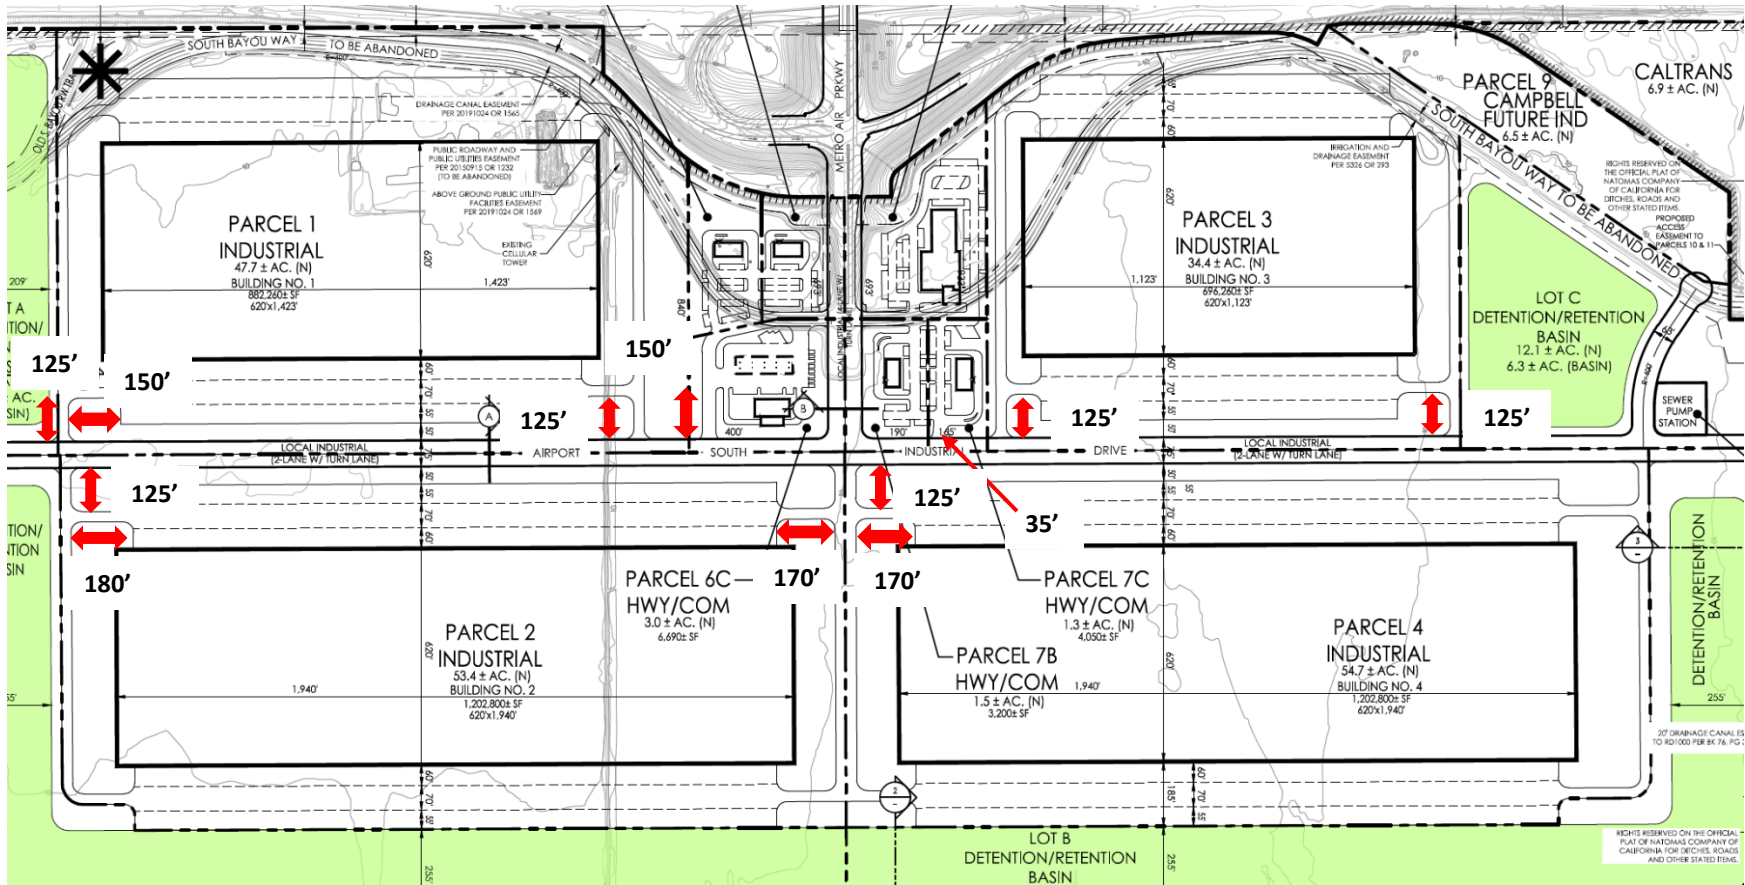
SITE PLAN THROAT LENGTH DIMENSIONS
